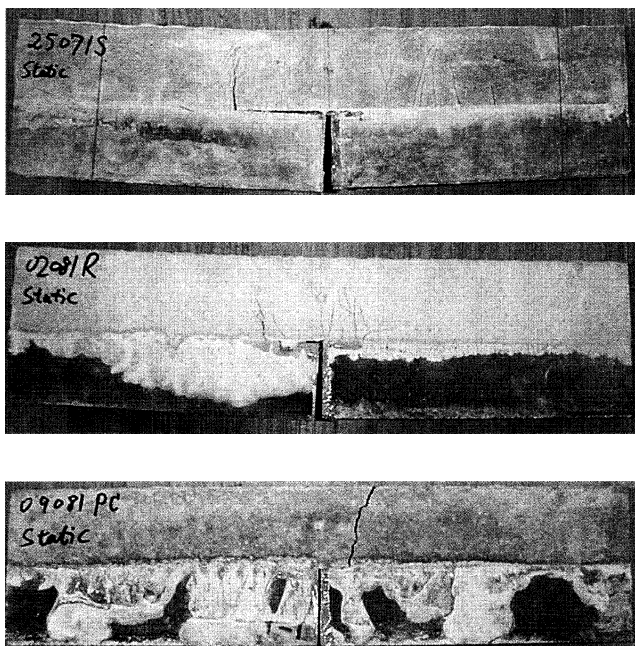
Crack patterns at failure of overlaid beams under static bending load: (a) ECC overlay with smooth casting surface, (b) ECC overlay with rough casting surface and (c) PC overlay with smooth casting surface.
